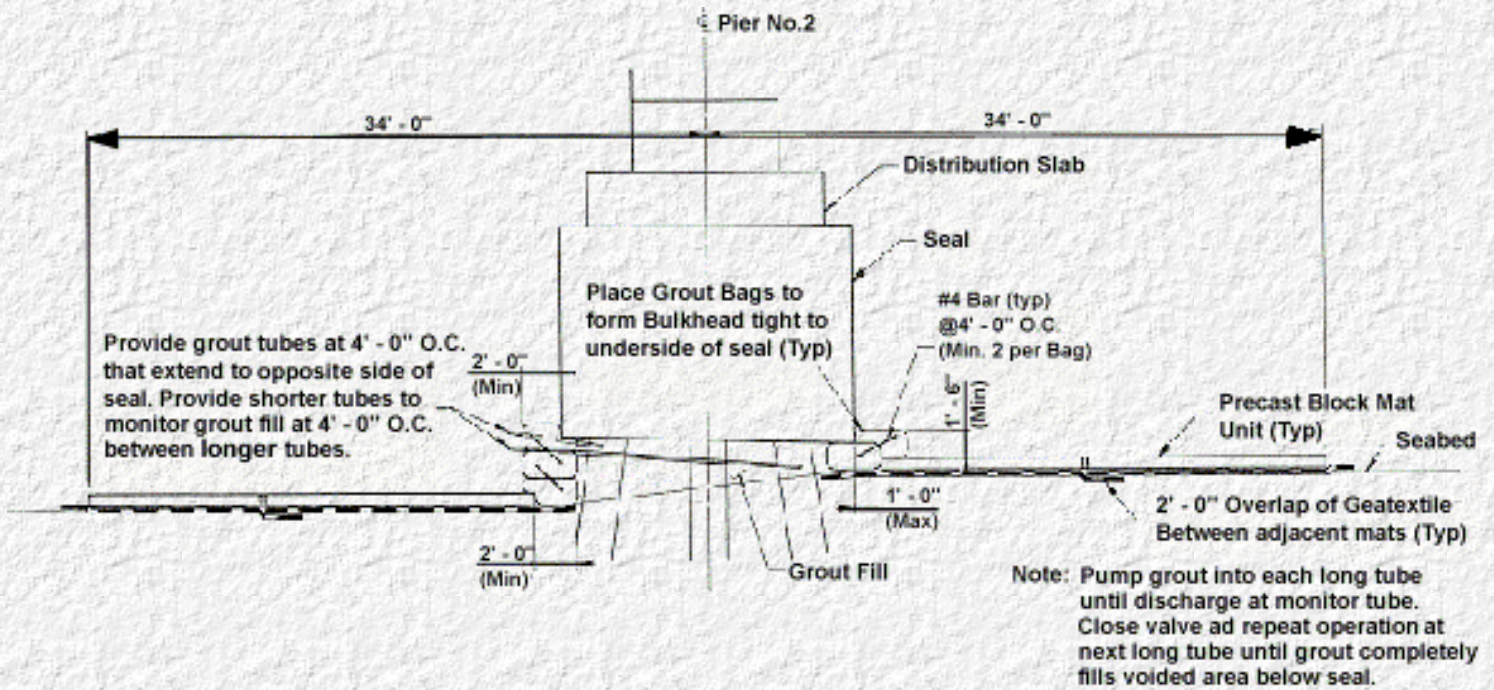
Design Plans of Cable-Tied Precast Block Mat for Tukey's Bridge, ME (MDOT)
